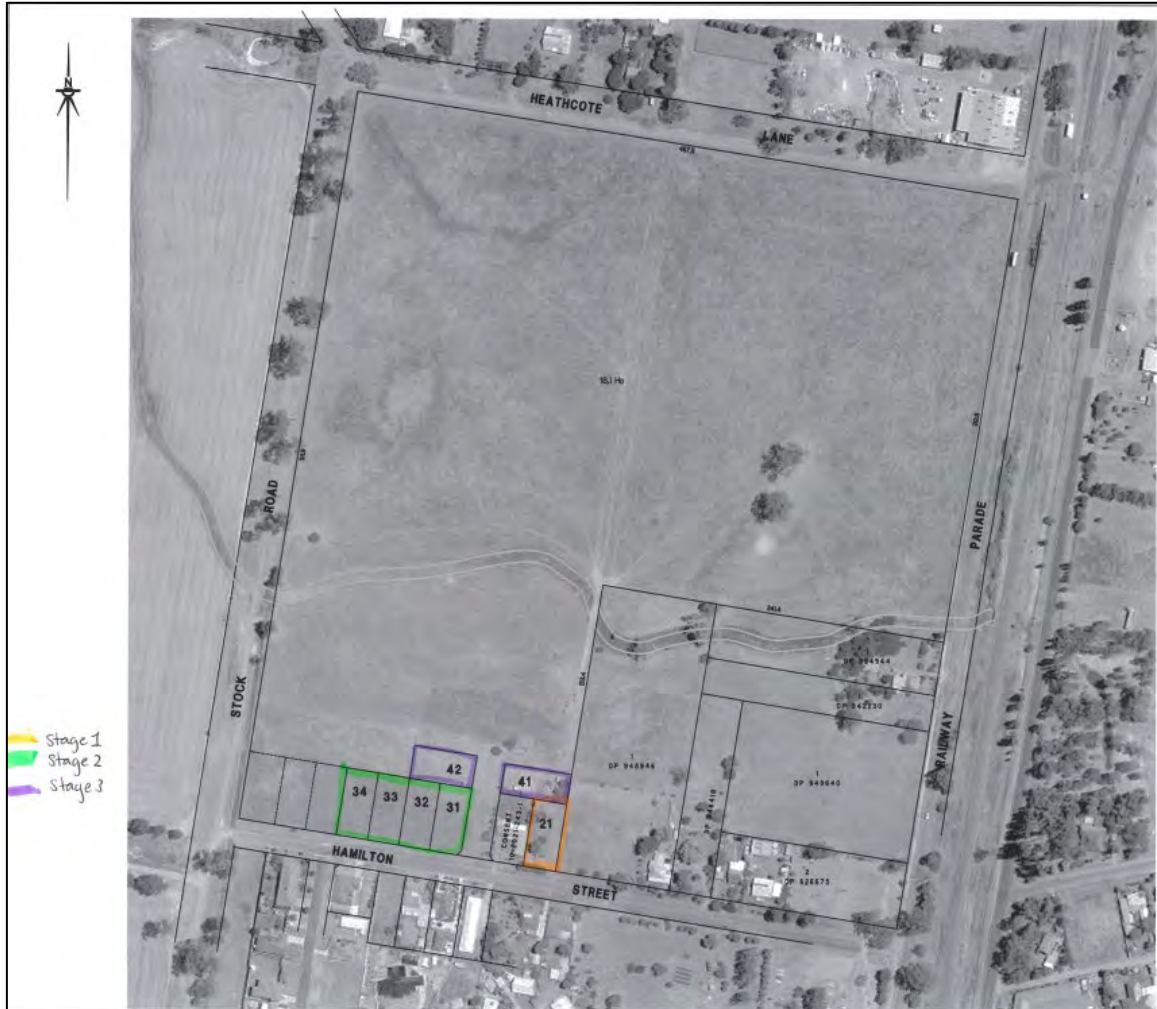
An overview of the proposed subdivision layout by the Applicant.
